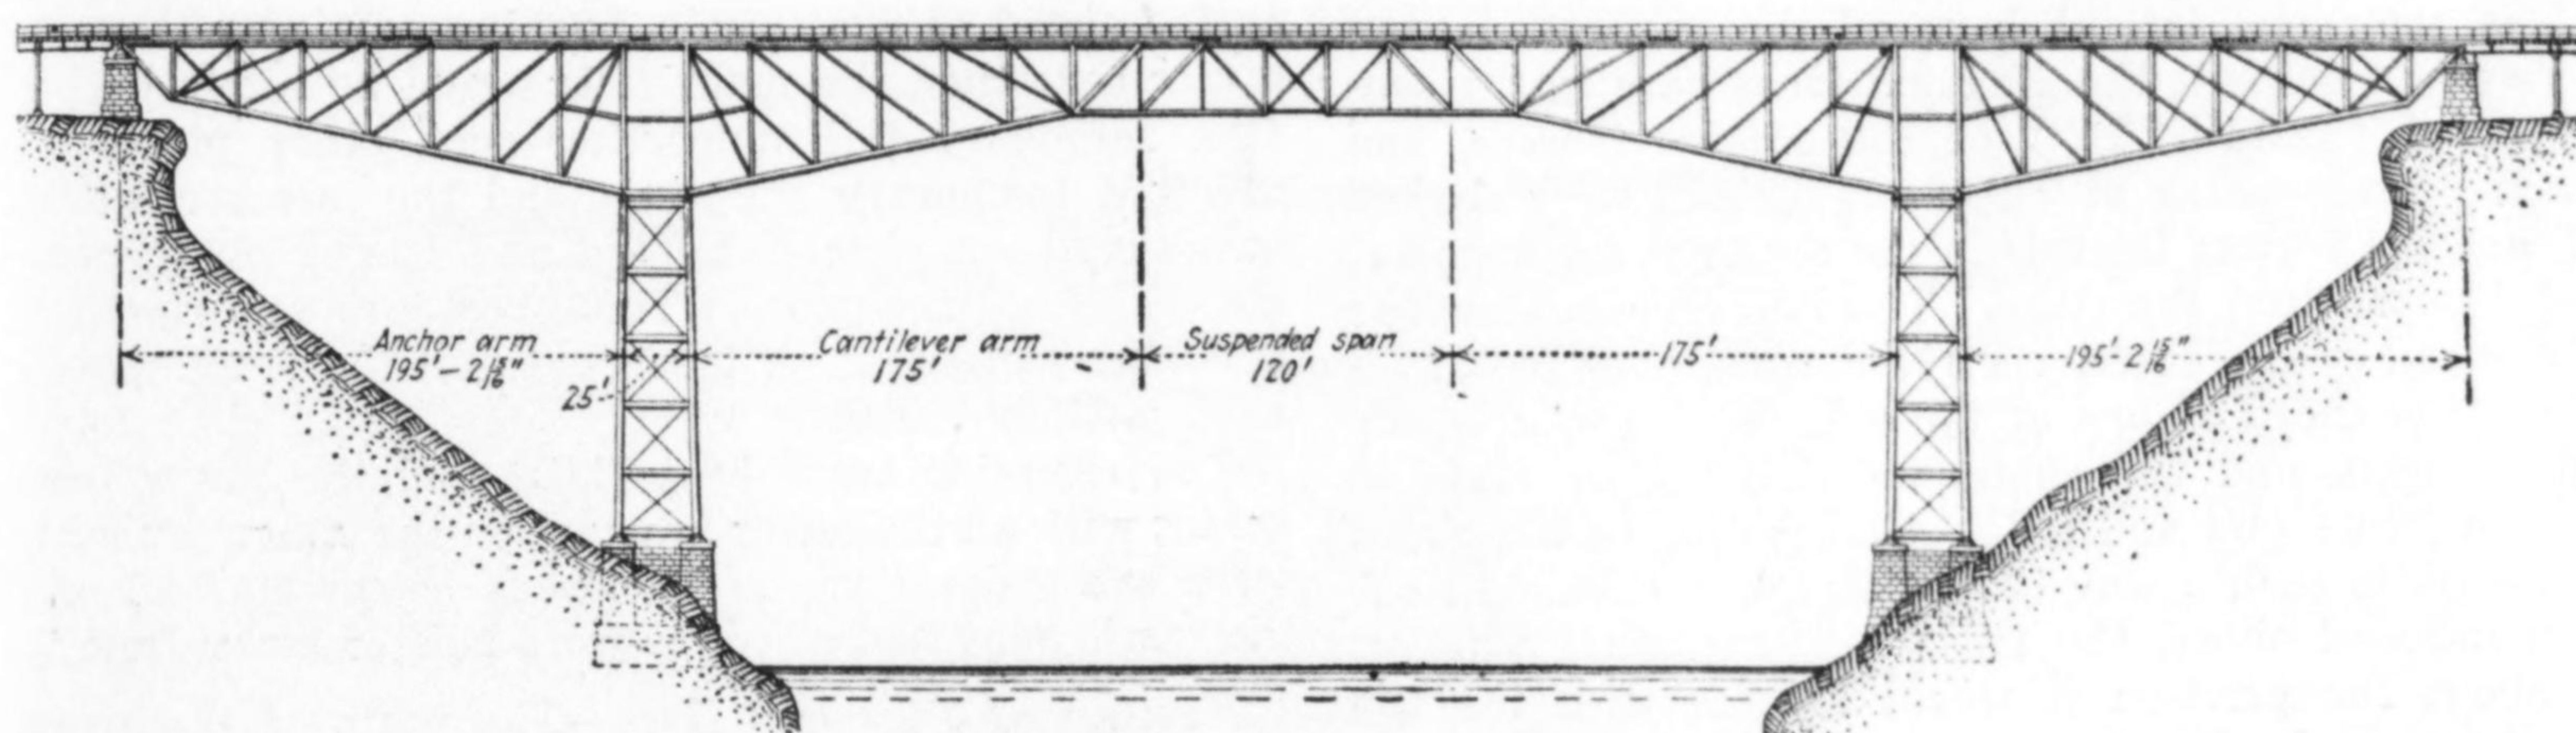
MICHIGAN CENTRAL CANTILEVER BRIDGE, AND DEMOLITION FALSEWORK
